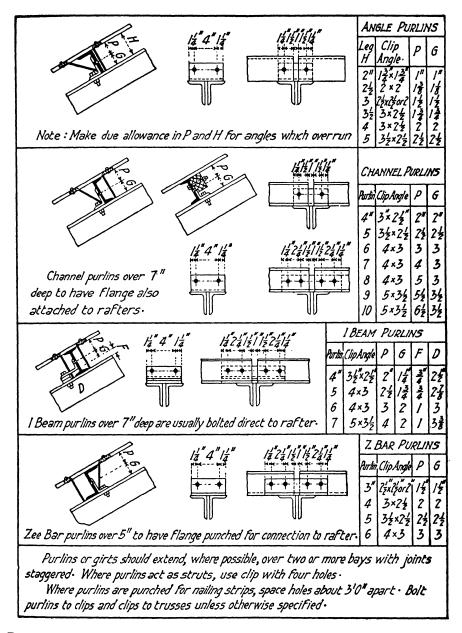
DETAILS OF PURLINS FOR CORRUGATED STEEL ROOF. AMERICAN BRIDGE COMPANY.
